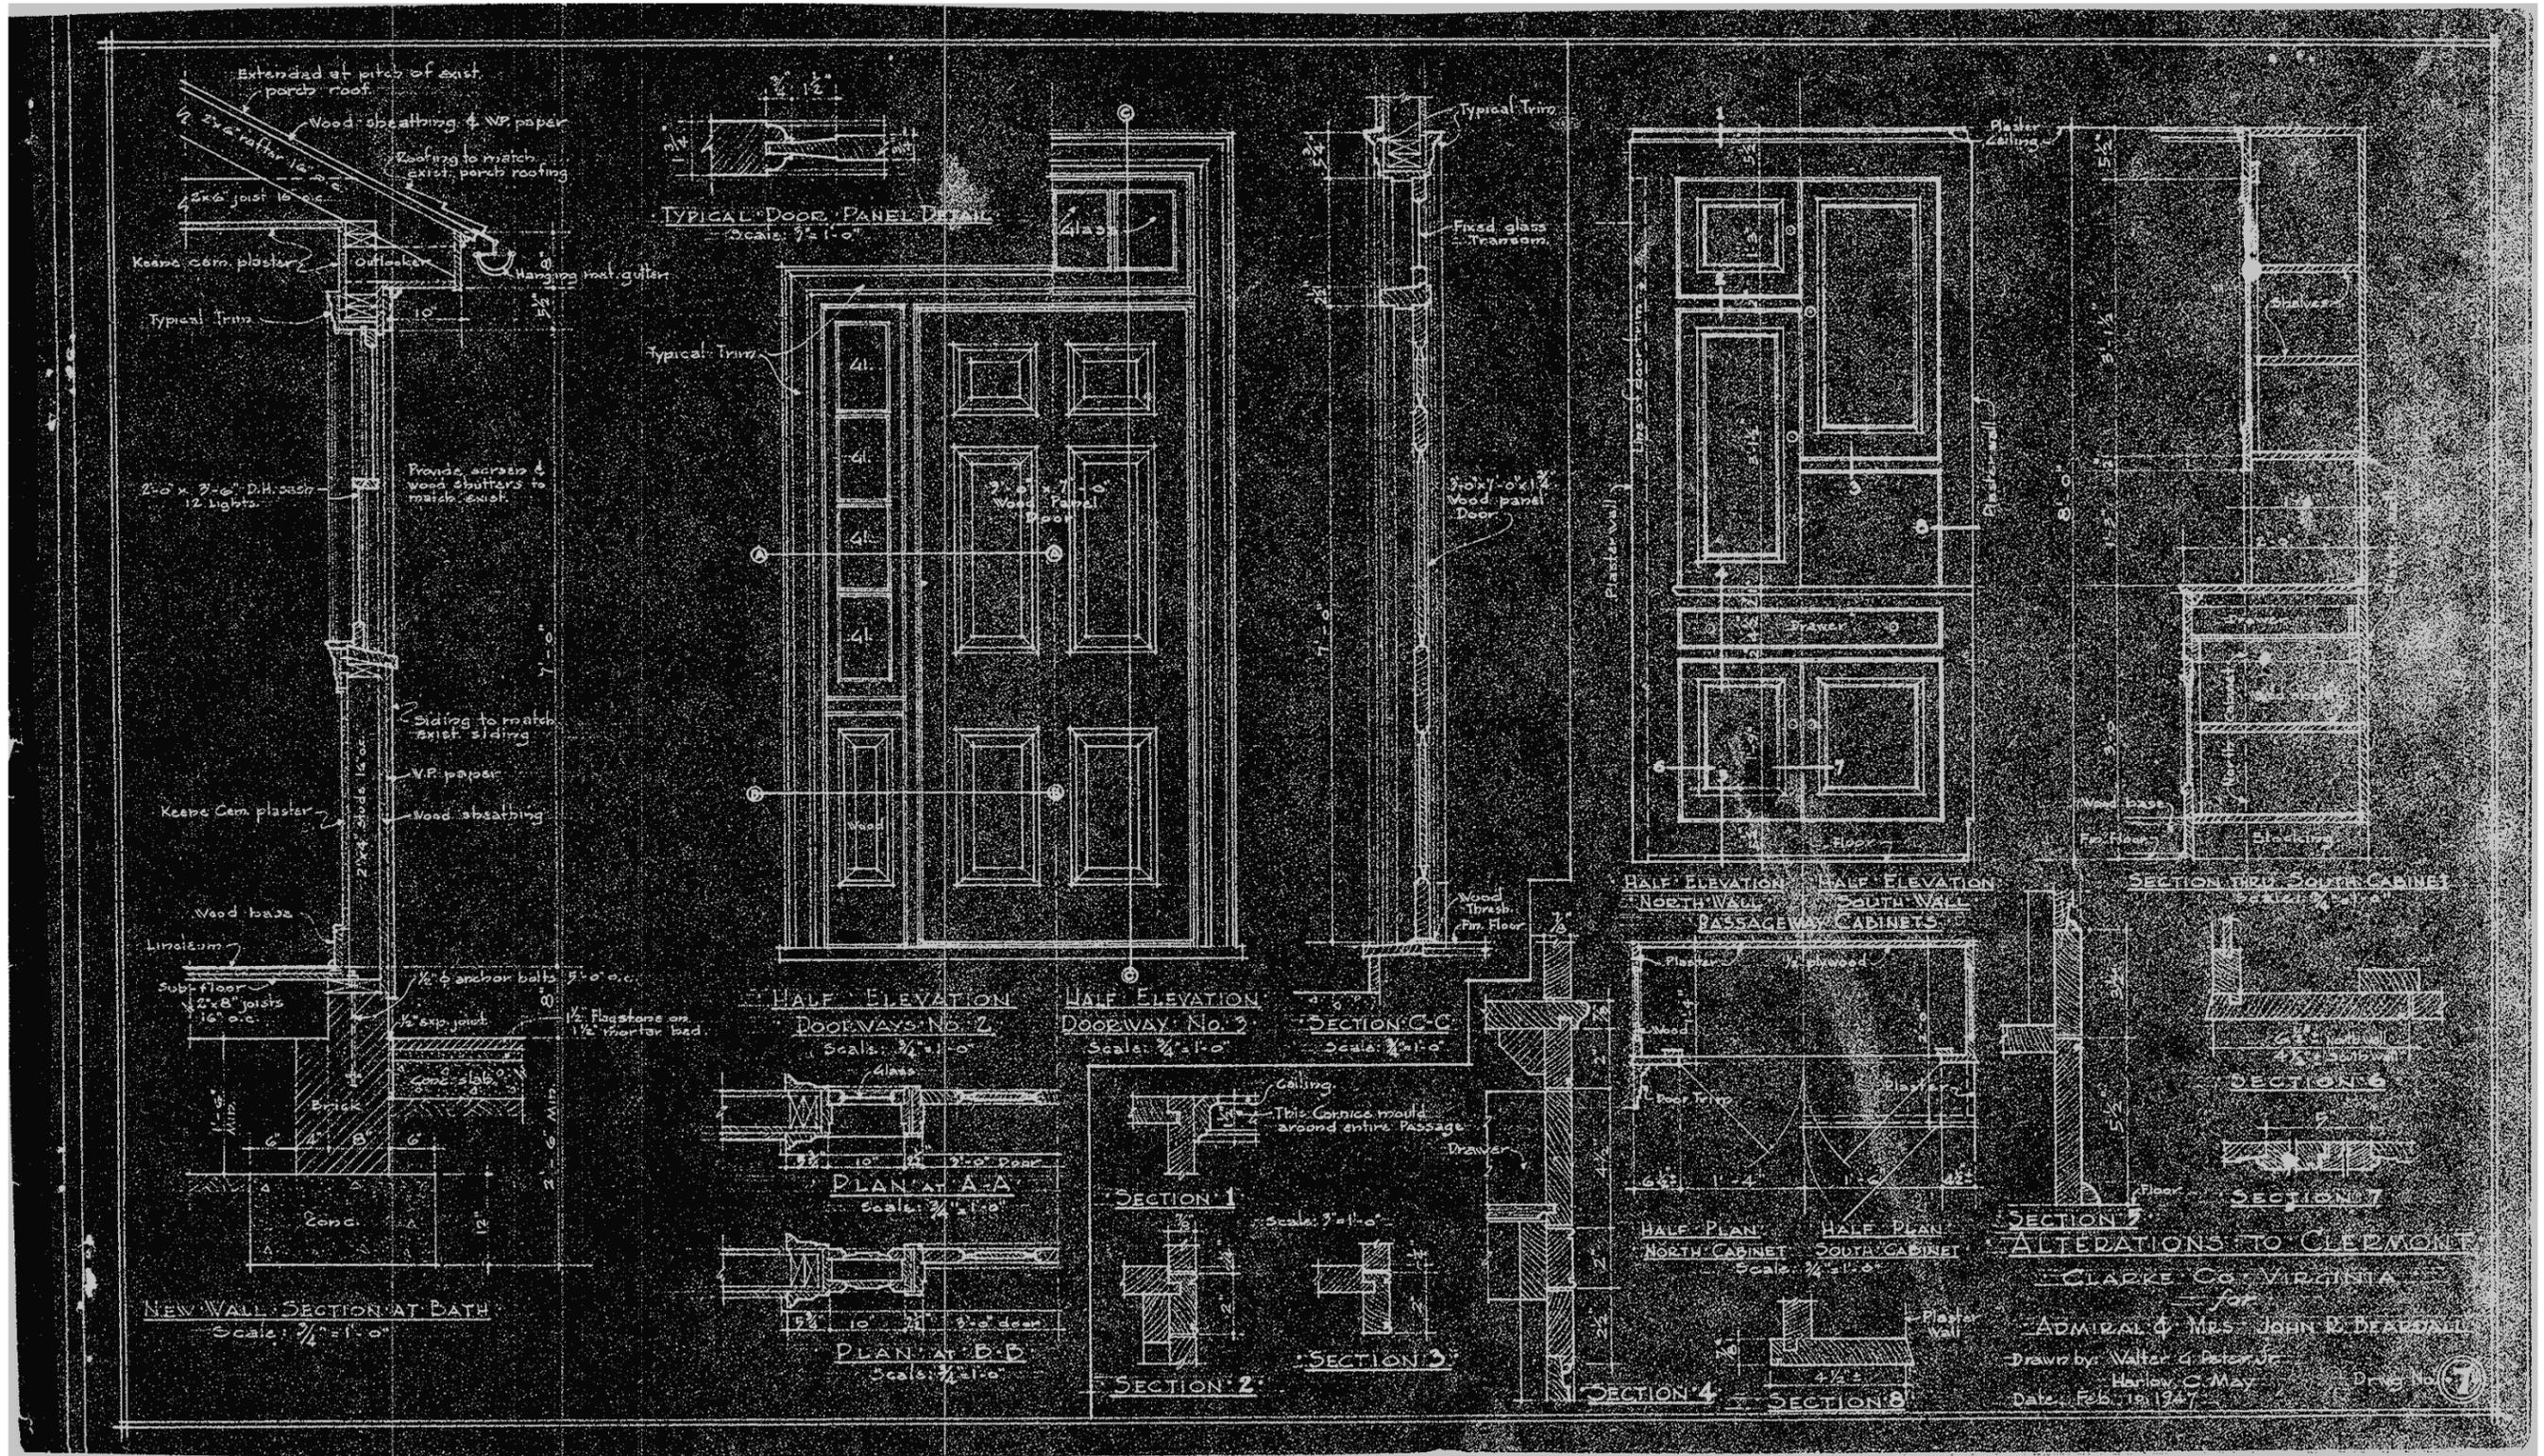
Wall section and door details of the 1947 alteration construction drawings (not to scale).
